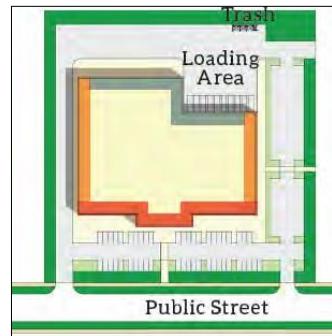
Option No. 1: Preferred Site Layout (building front is facing public roadway).
